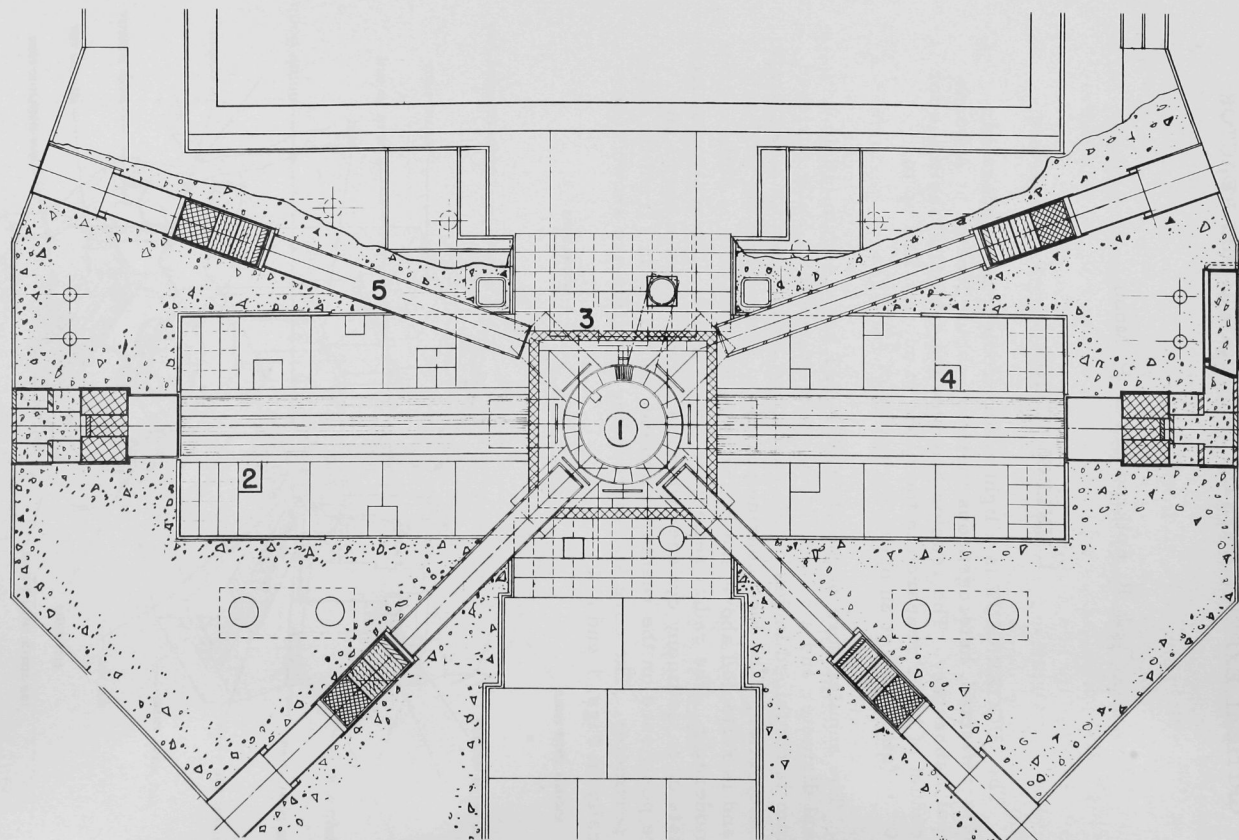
JUGGERNAUT Section Showing Chamber Positions
